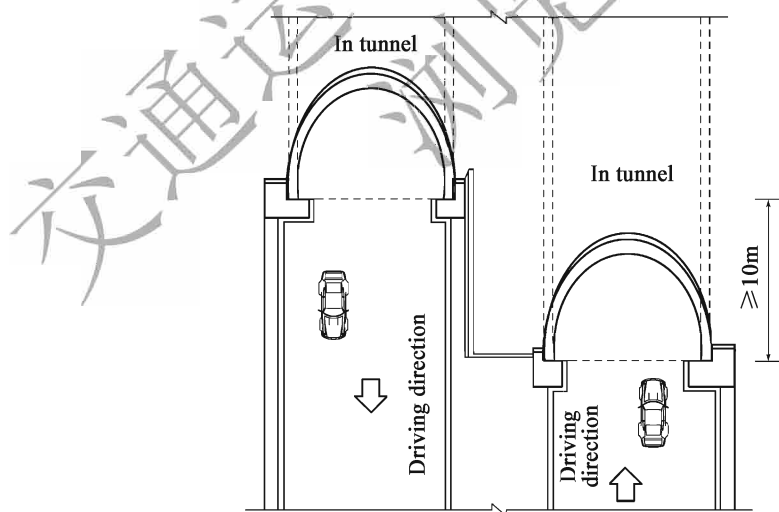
Layout of tunnel portal to avoid impact by bypass flow
